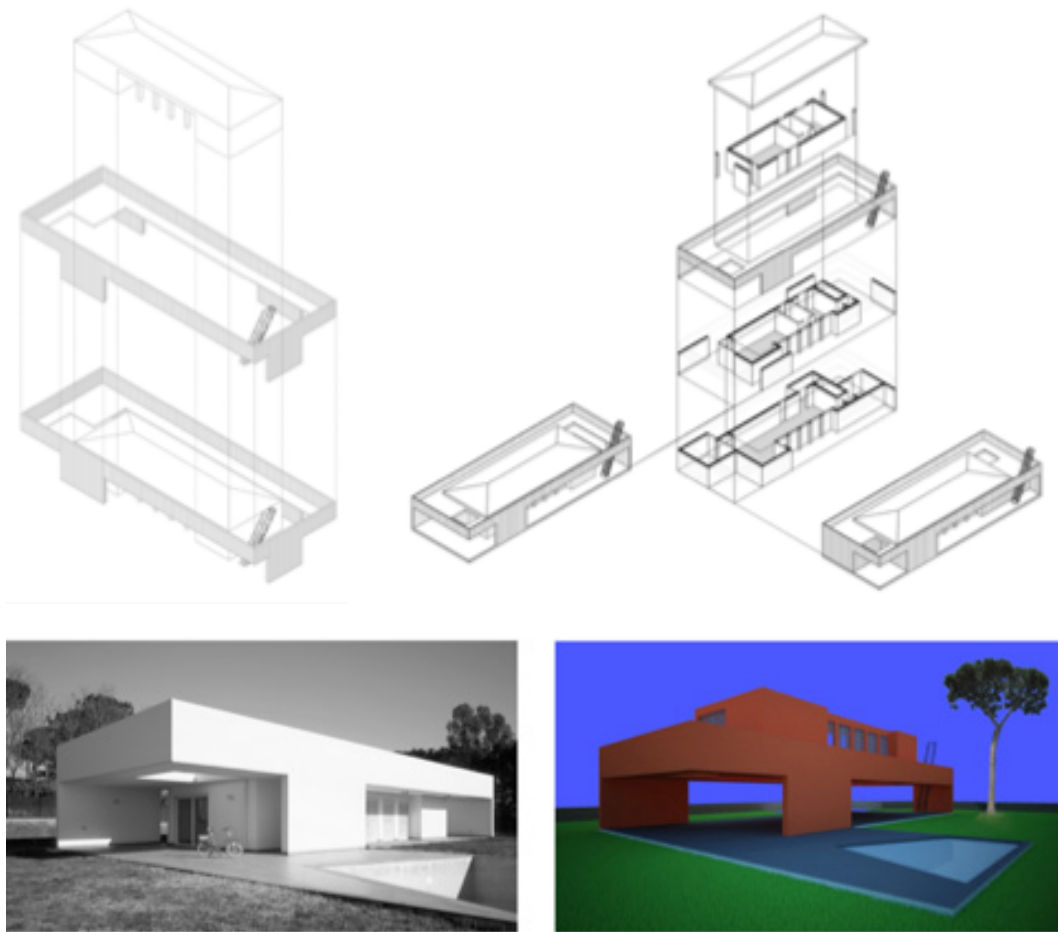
, 12, 13, 14 Lina Malfona, Slot House, design ad extension, axonometric views; built house and future extension
